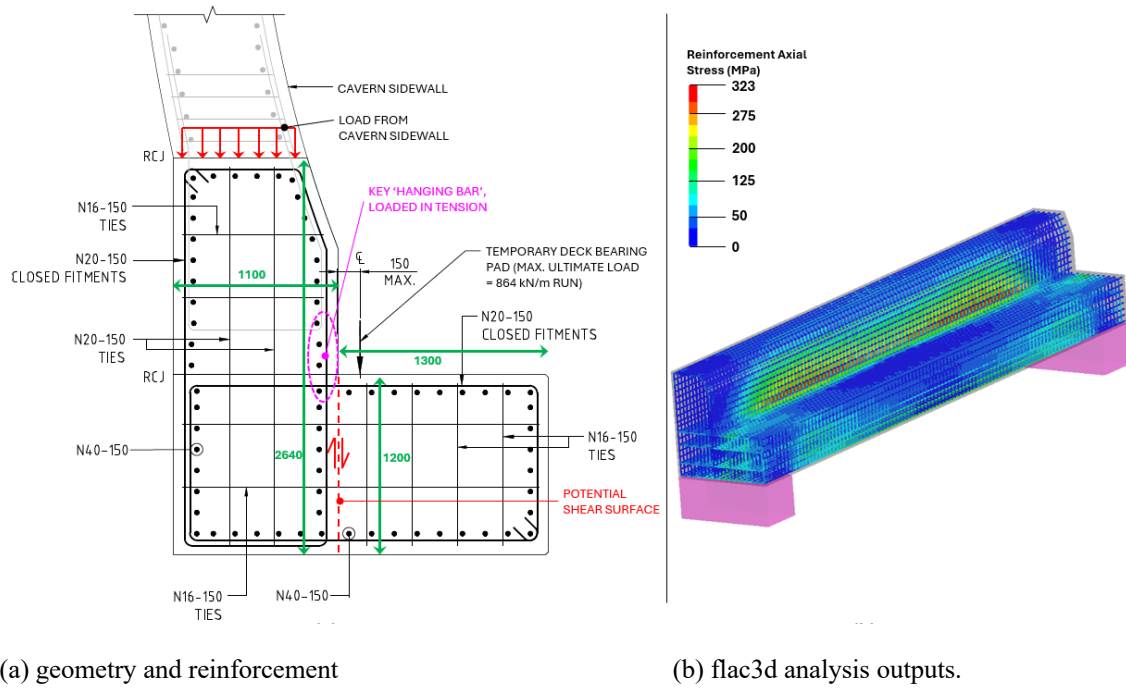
Kicker beam geometry, reinforcement details and structural analysis.
